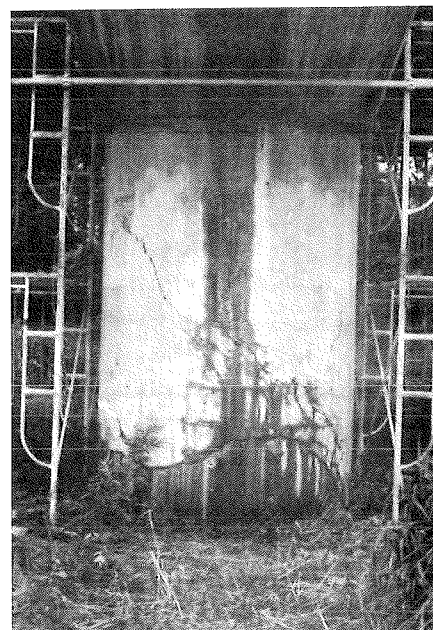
Pier of Prestressed Concrete Simple Girder Bridge
